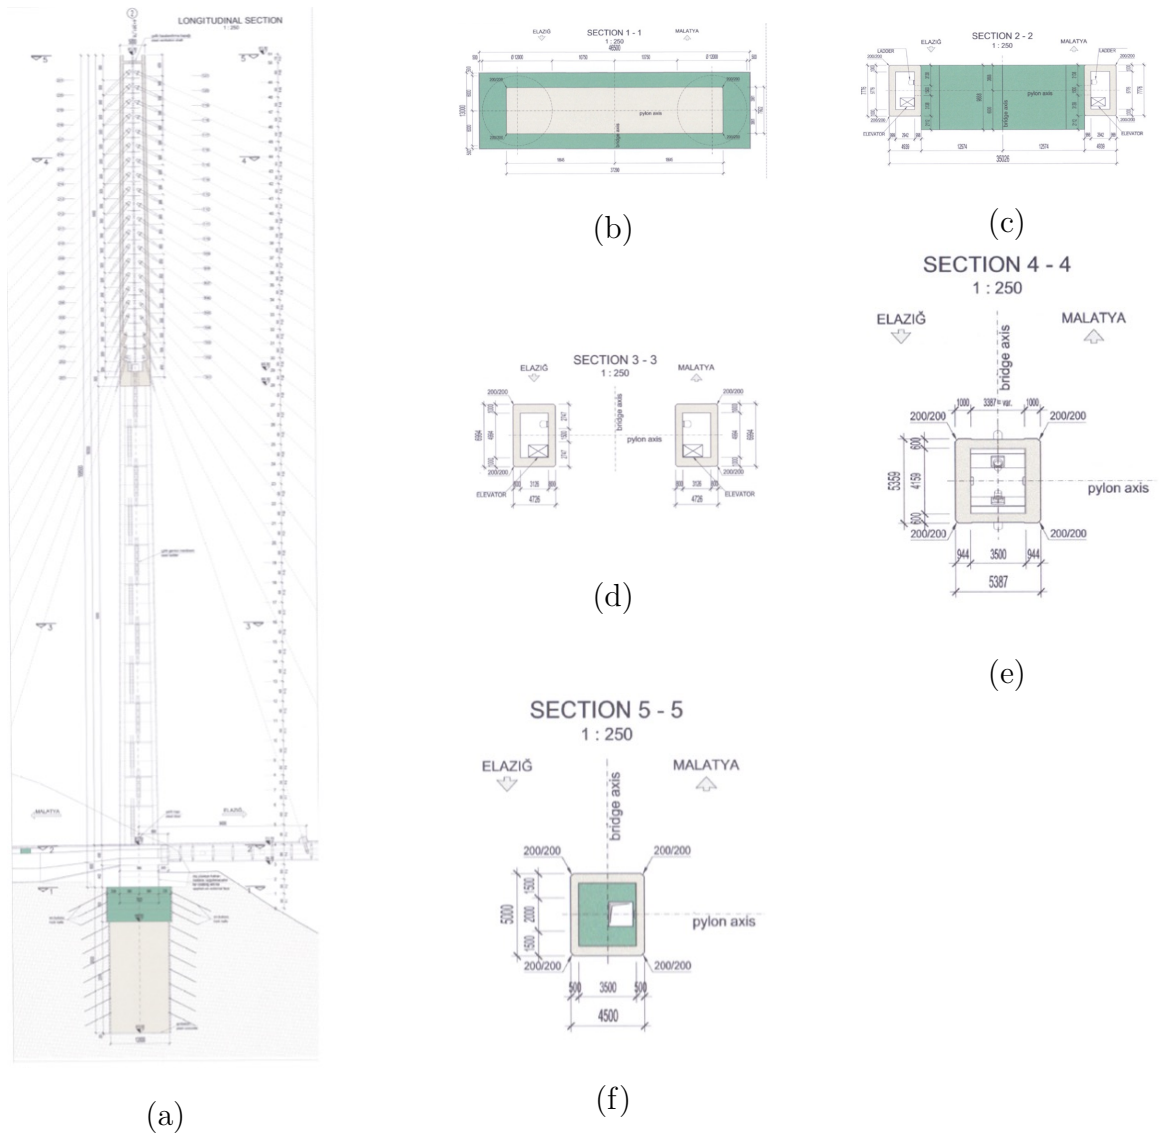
Cross-section details: (a) section longitudinal view of pylon, (b) section 1-1, (c) section 2-2, (d) section 3-3, (e) section 4-4, (f) section 5-5.
